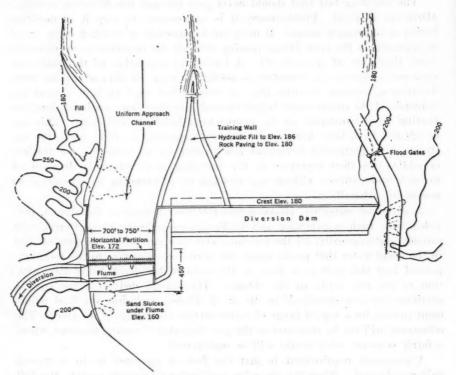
TENTATIVE PLAN OF DIVERSION WORKS.
